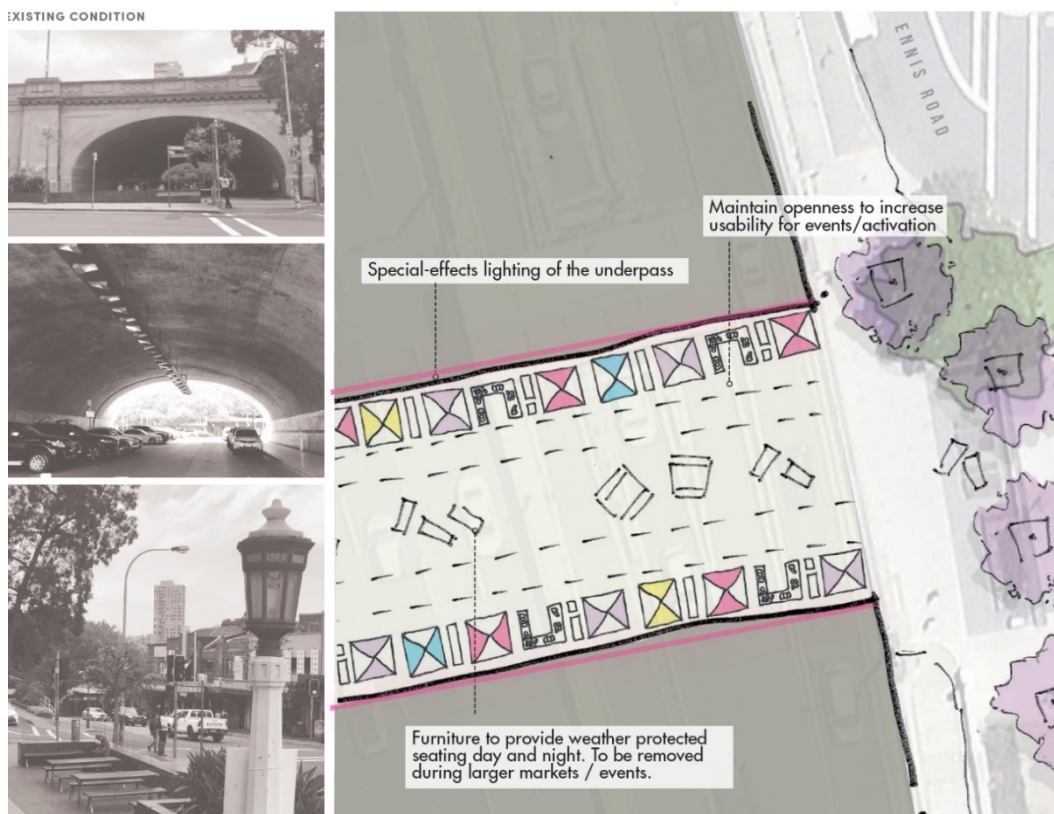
Site Plan - Pilot Burton Street Tunnel – Kirribilli - Pedestrian Plaza Concept
